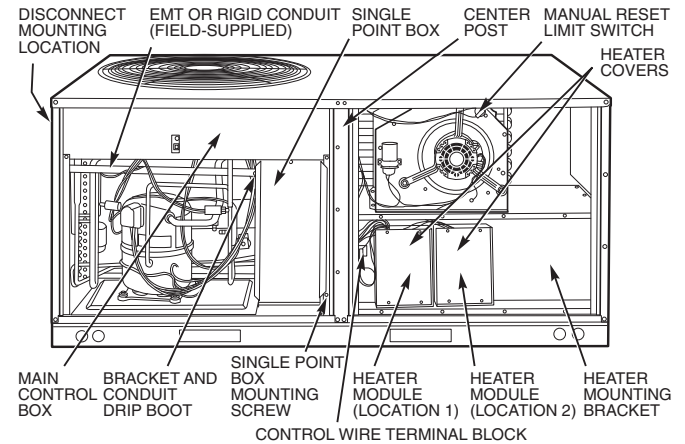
Typical Access Panel Location (3-6 Ton)
